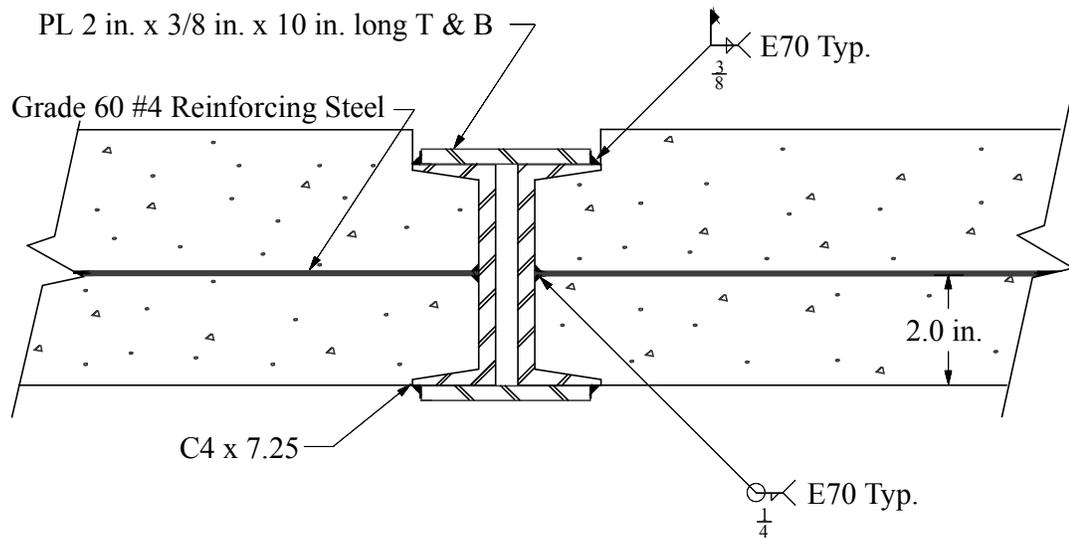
Side view of PCDT connection after adjacent units are welded together.
